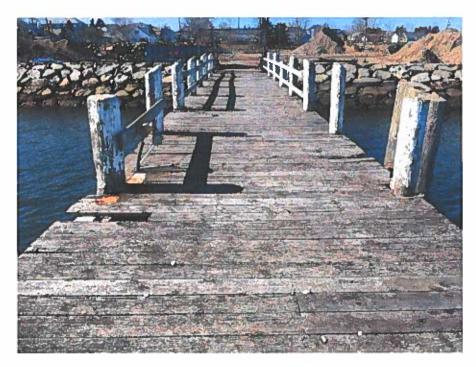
Bent 8 Inshore: Missing and Deteriorated Decking and Missing Railing.
